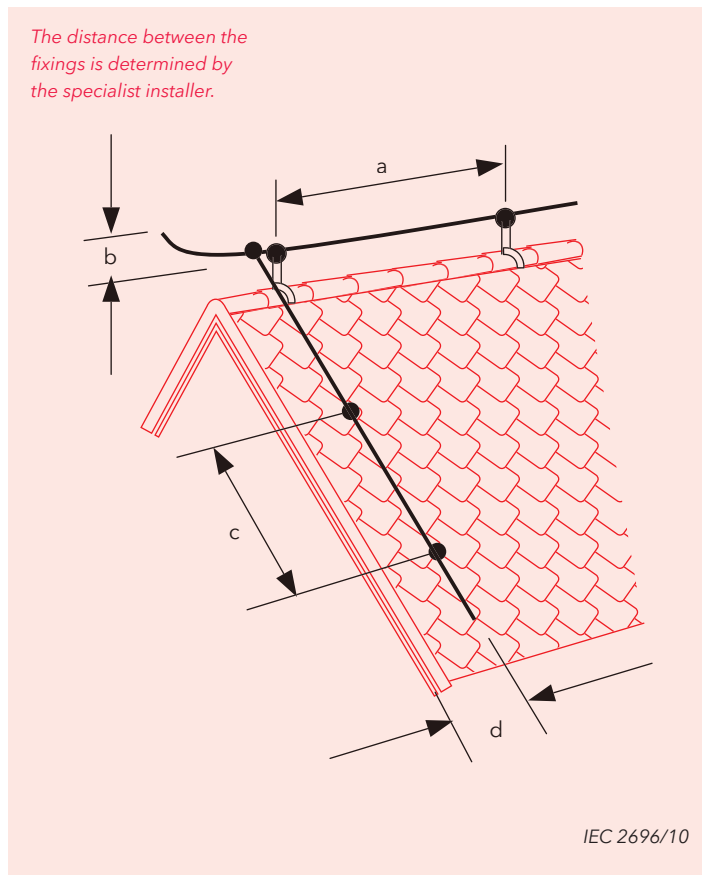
Installation of air-termination conductor on the ridge of a sloped roof and a roof down-conductor
